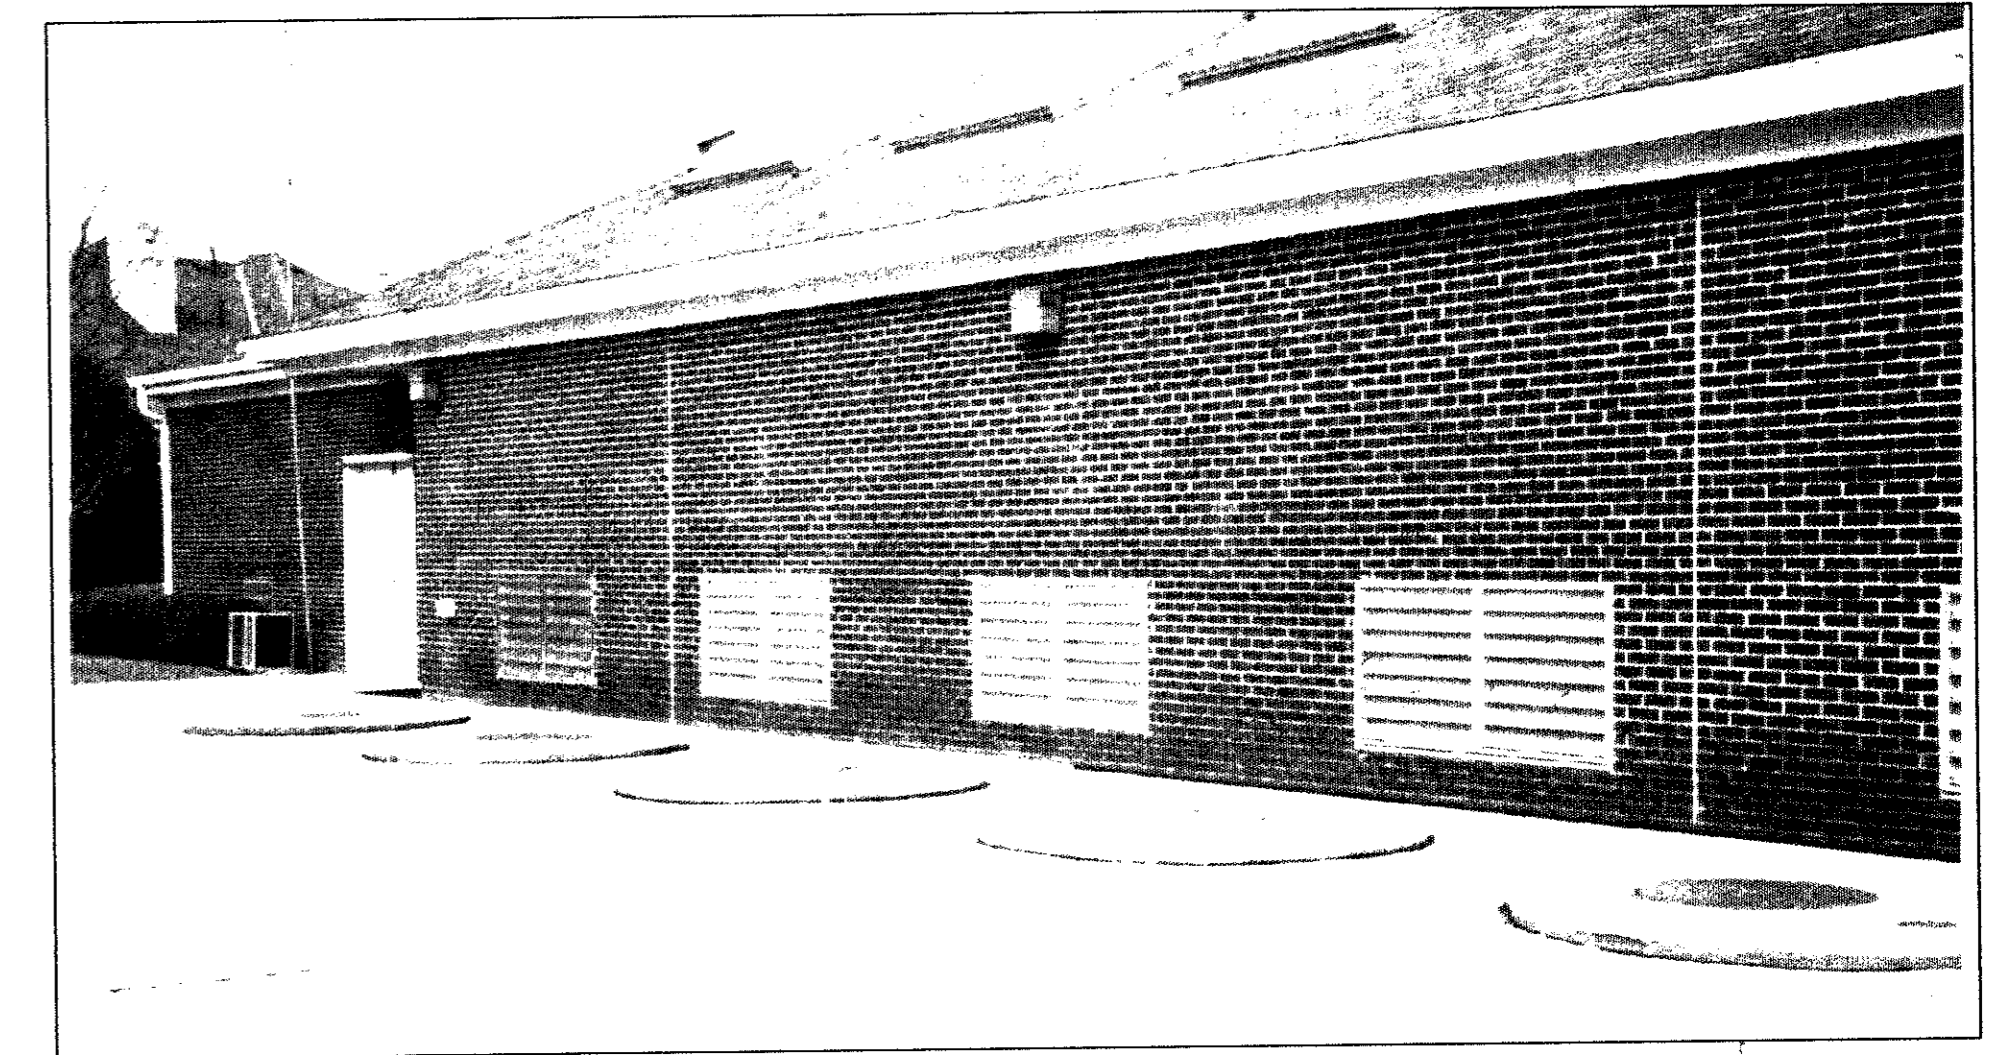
PUMP STATION BUILDING SOUTH WALL
